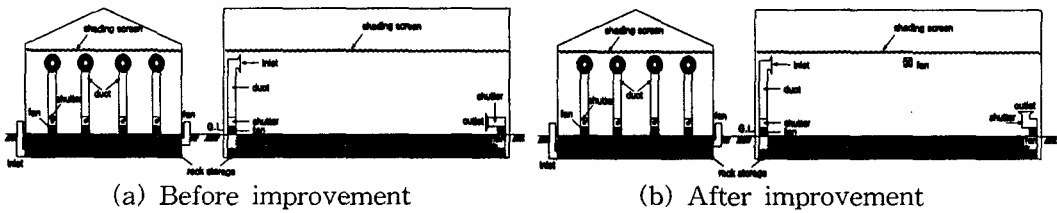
Improved solar heated underground rock storage greenhouse system.
